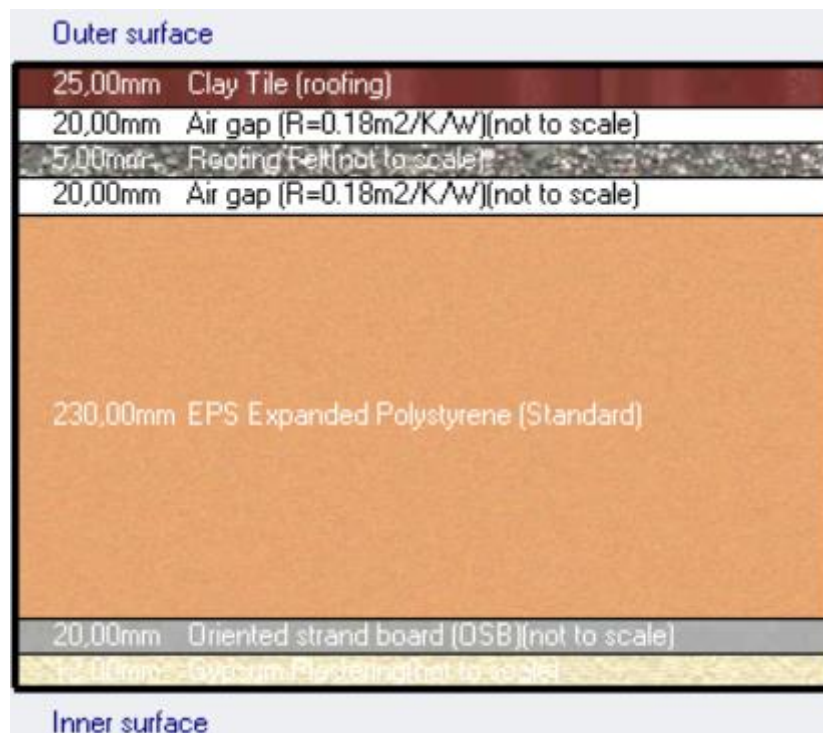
Detail of the roof of the both houses in DesignBuilder (high insulation)
